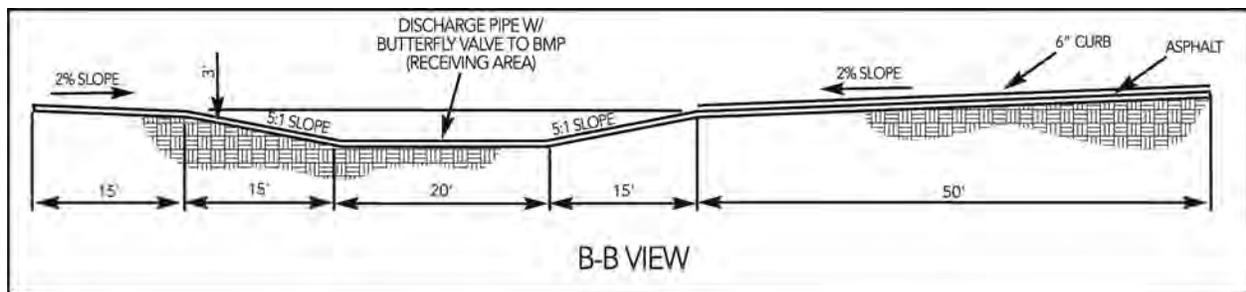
Wheel Wash Elevation View (Section B-B)
